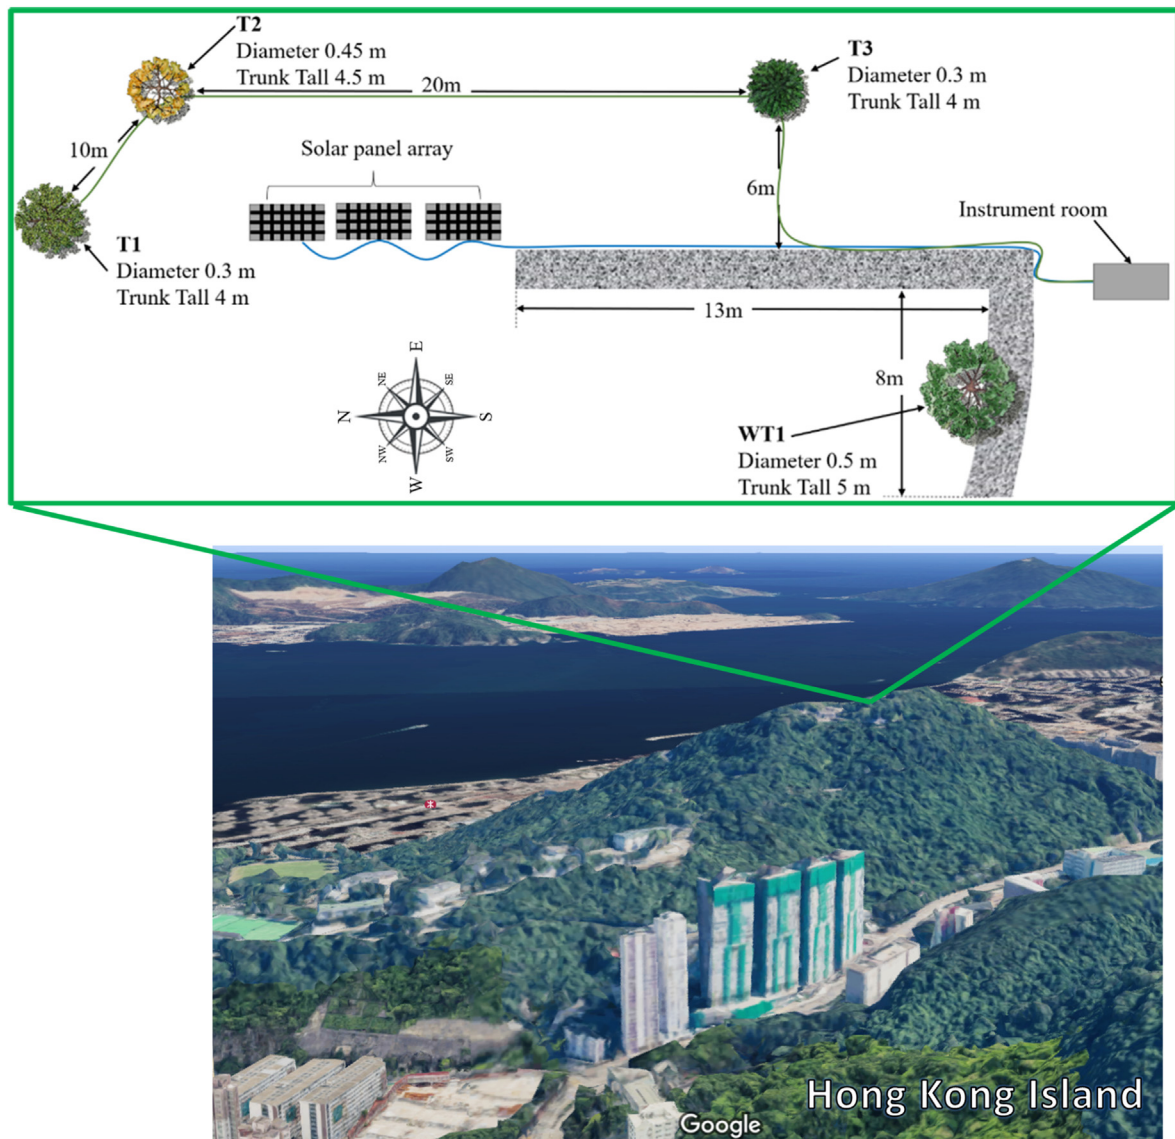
Schematic diagram of the masonry retaining wall and trees at the monitoring site.
